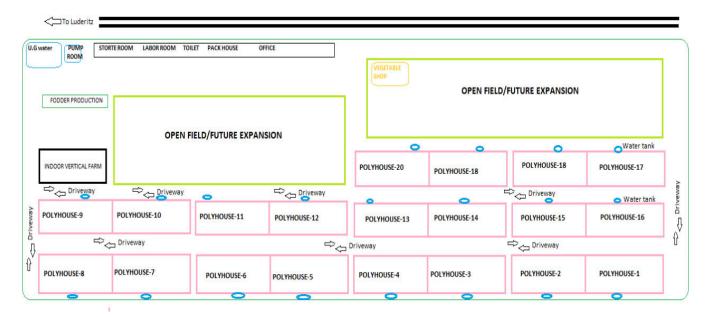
Proposed layout plan (a detailed layout plan is available but will only be provided in the EIA/Scoping Report).
